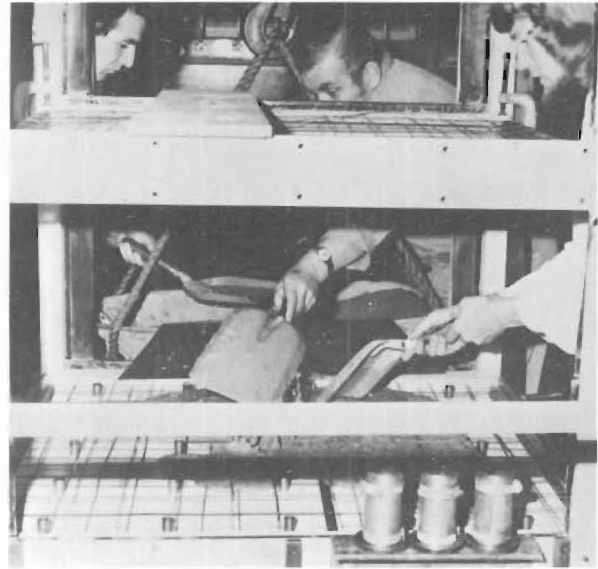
CASTING OF A FLOOR SLAB
